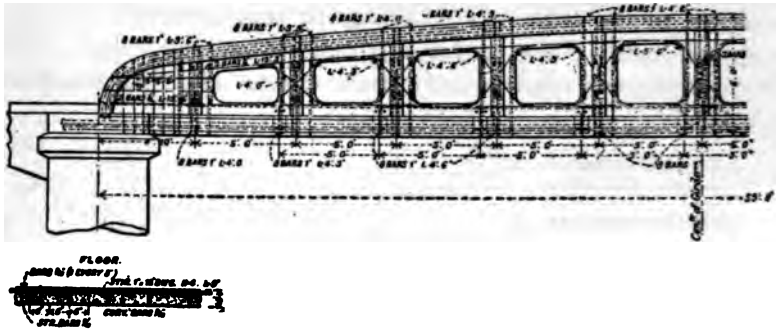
Half Elevation, Open Web Girder Bridge, Purfleet, 'England.
